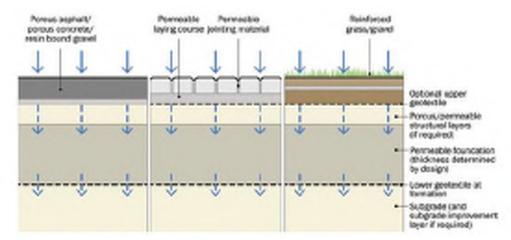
'SUDs Manual Figure 20.14 Pervious Pavement System Type A- Total Infiltration'
